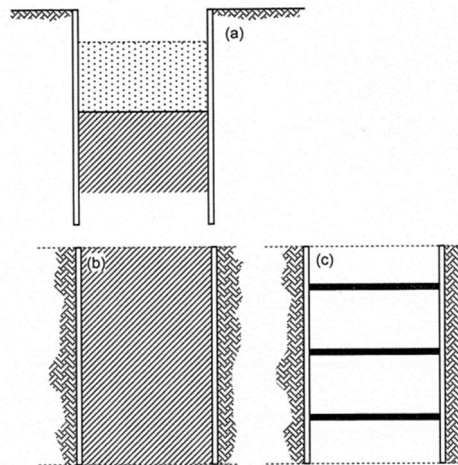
Schematic geometry of interventions linking facing walls (Callisto, 2011)
